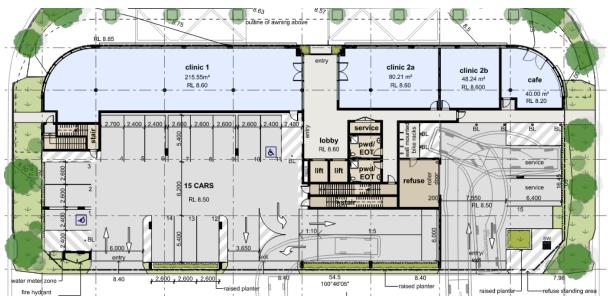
Ground Floor Level Floor Plan. Source: Sparc - Issue N dated 05/03/24
